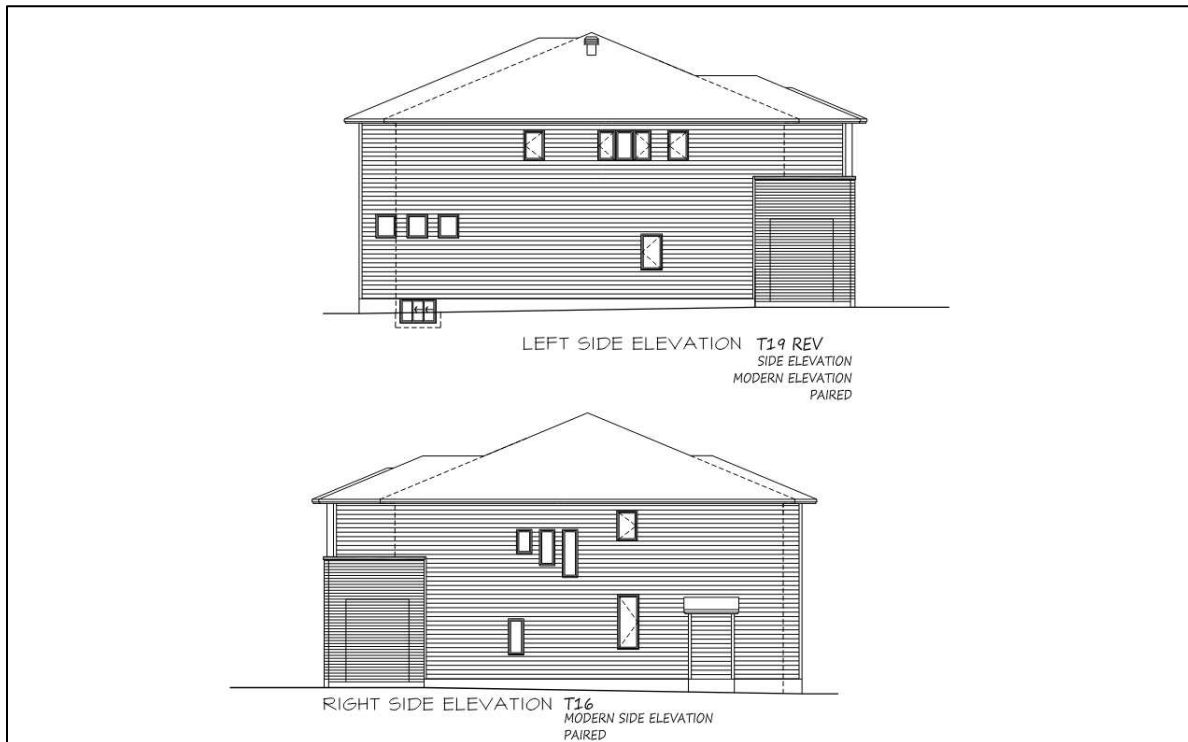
Left and right side Modern townhouse dwelling elevations prepared by Tamarack Homes.
